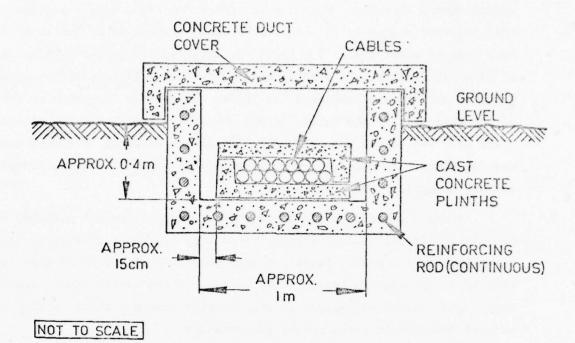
Use of concrete plinths to support cables in a reinforced concrete duct in an existing installation. The clearance thus maintained between the cables and the duct walls reduces the probability of cable damage by lightning currents in the duct walls.
